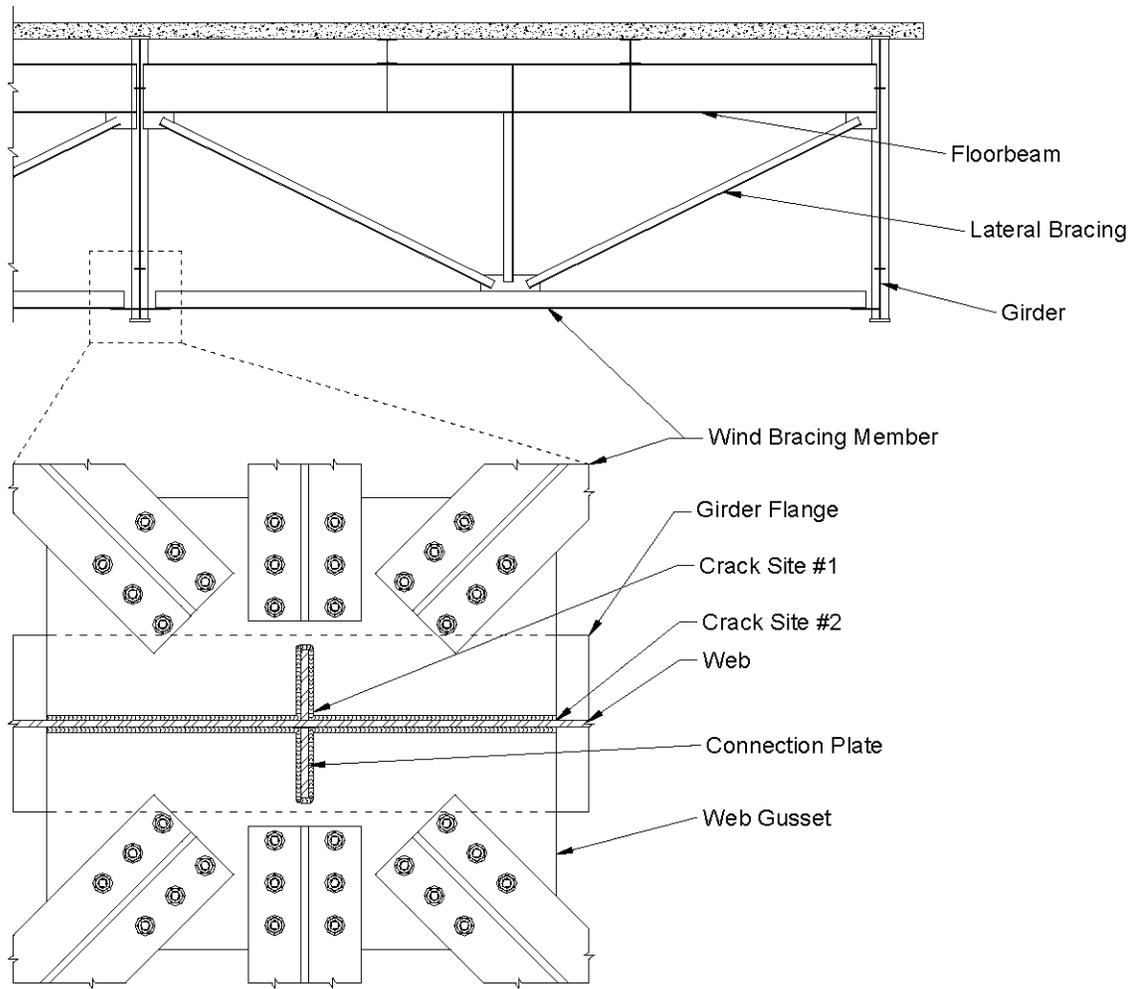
Typical cross-section of a deep girder bridge (top) and plan view of the web gusset detail (bottom).
